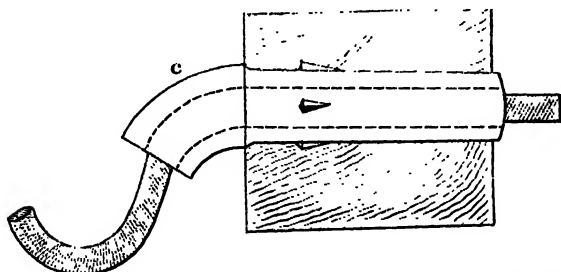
Porcelain Drip Tube for Protecting the Wires from the House Wall and Preventing Water from Following the Wires Inside
